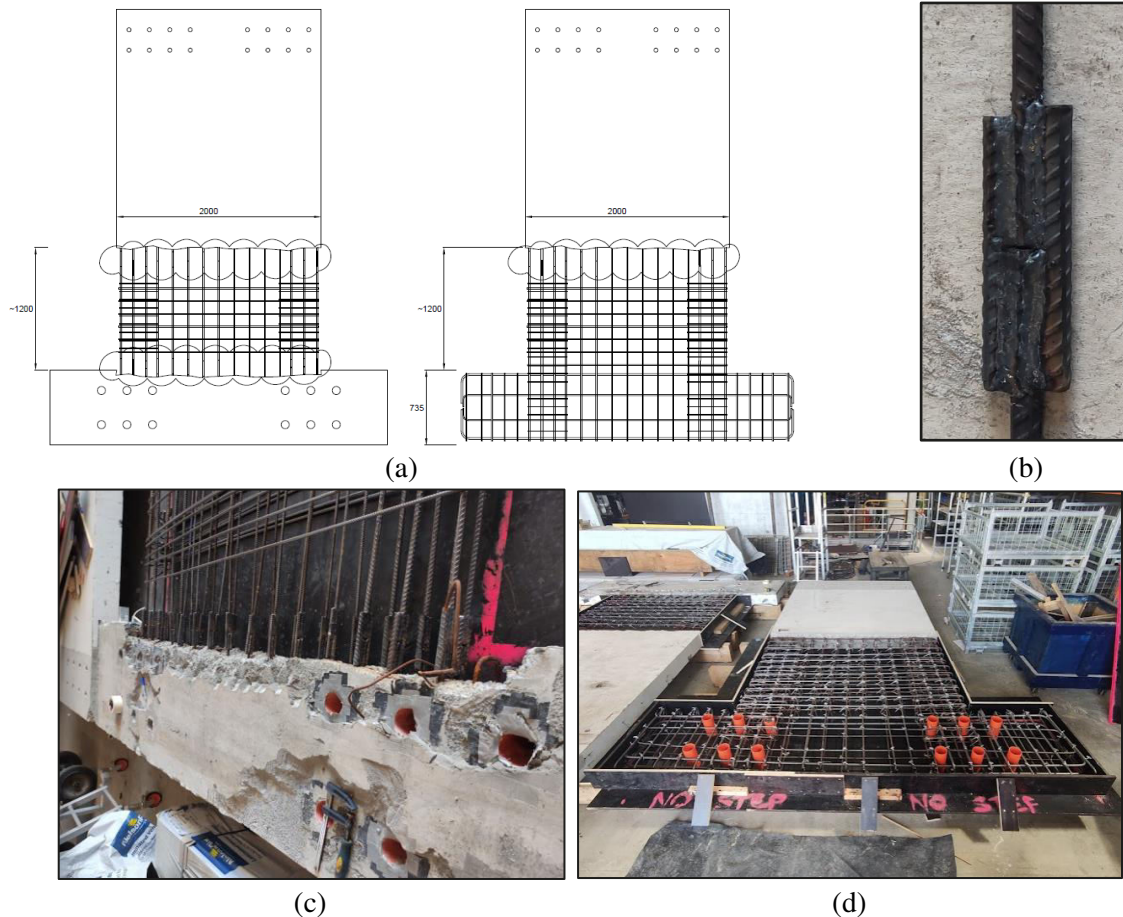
Repair procedure, (a) walls W5D-R and W6C-R, (b) indirect butt welded connection used for the repair, (c) Welded connection at the base of wall W6C-R, and (d) wall W5D-R before pouring the new concrete.
